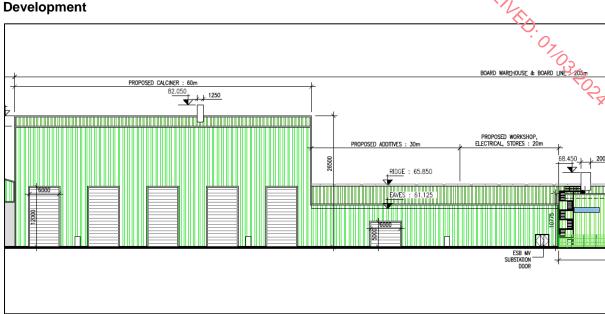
Locations of Additives, Workshop, Electrical and Stores of the Proposed Development
